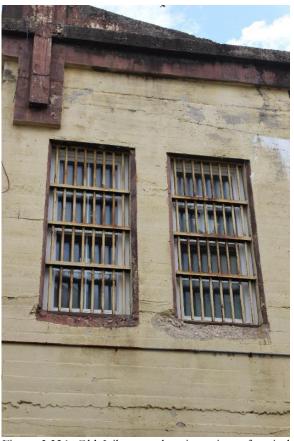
, Old Jail, west elevation, view of typical second-story windows at the high-roofed south section. Note the concrete spalling where the sills are missing.
